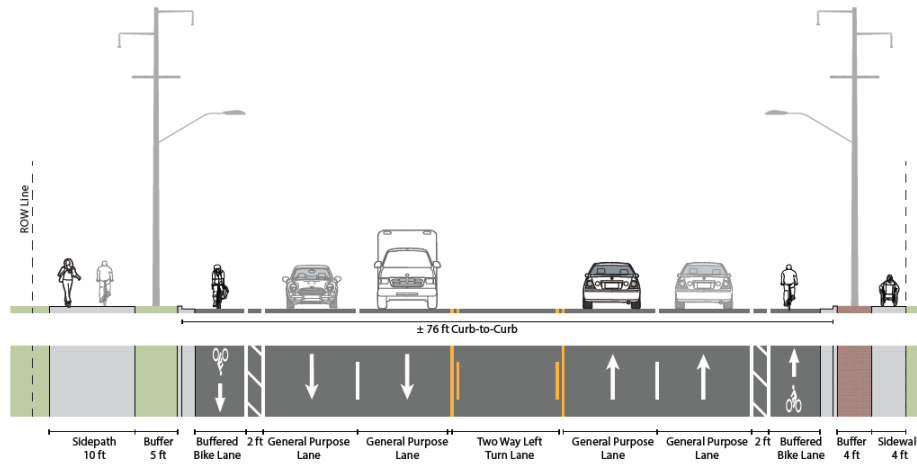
Proposed Antelope Drive & DRGW Trail Connection
